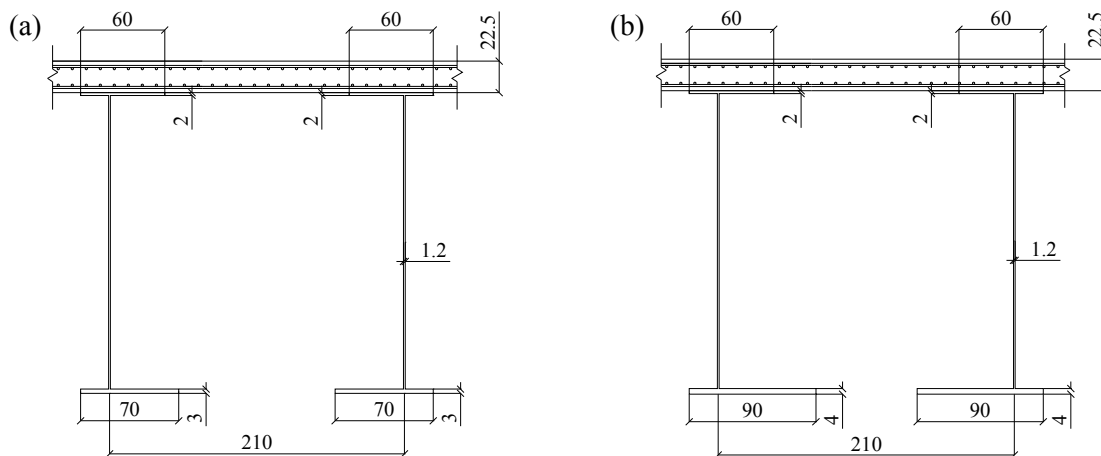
Size (cm) of transversal cross-sections of a span structure: a – in the span; b – on the support.
